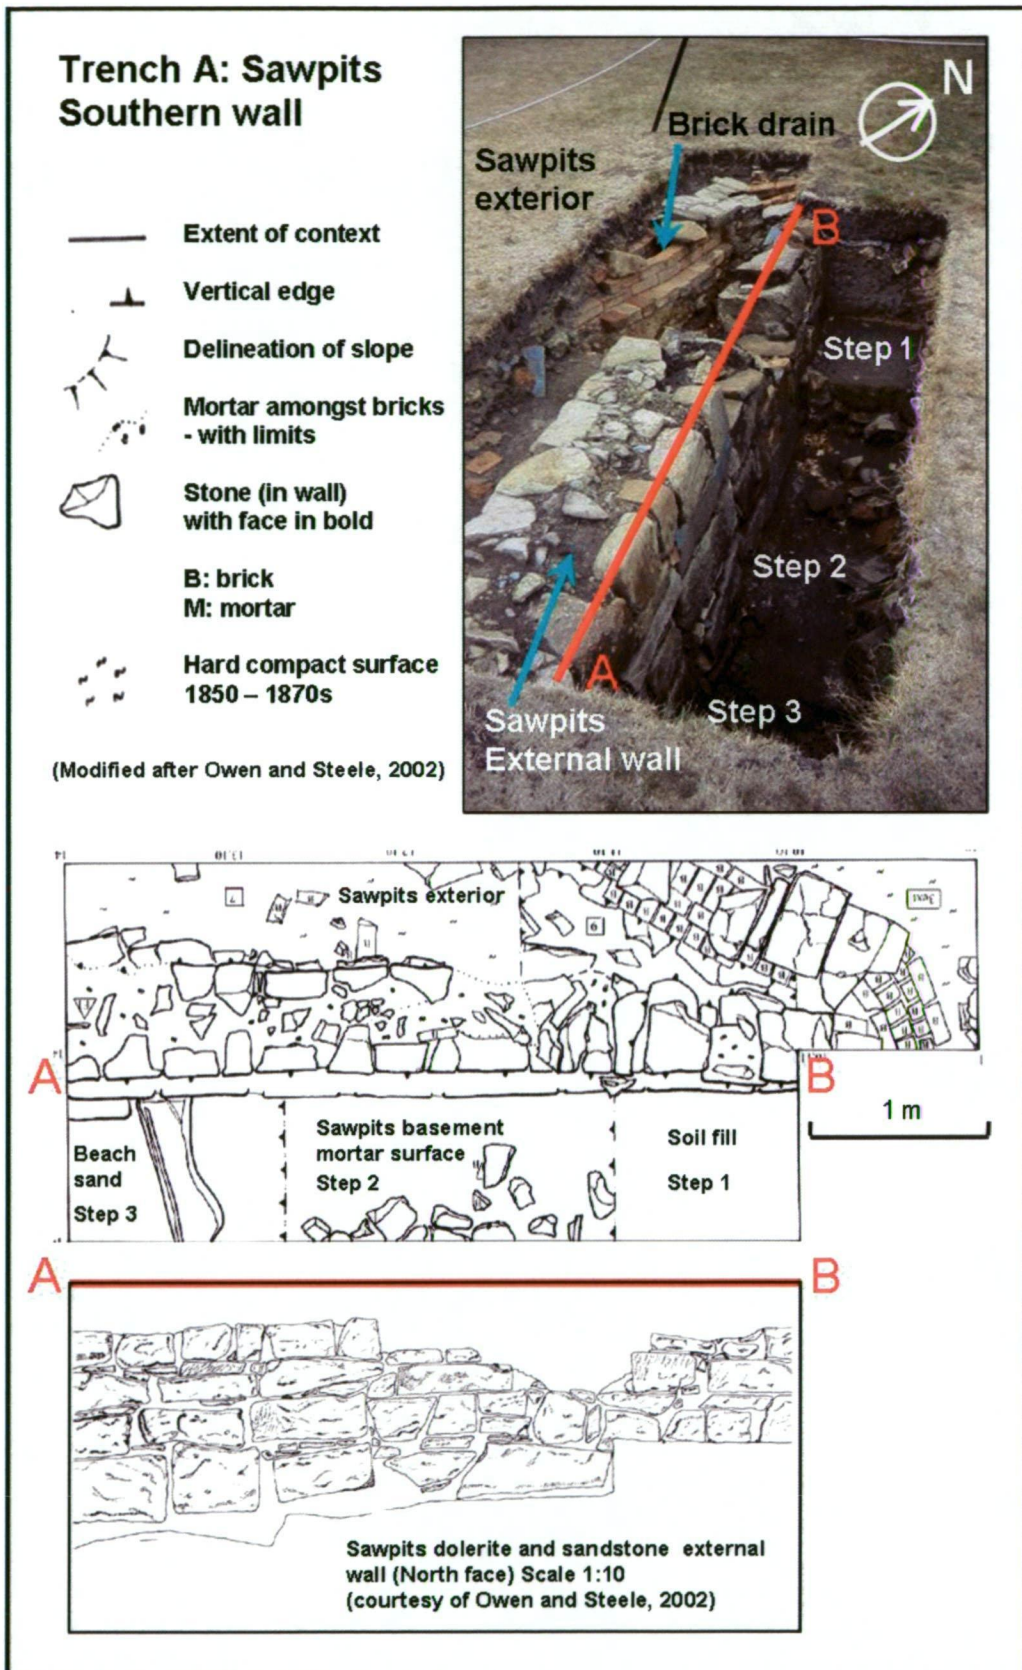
Photograph of Trench A (right) showing the Sawpit dolerite and sandstone external wall and contemporaneous brick drain with dolerite capping blocks. The Sawpit mortar floor deposit was uncovered at 1.43 m depth, as seen here with some of the rubble pit fill (photograph courtesy of the J. Johnston, 2002). Trench A final excavation plan (centre) and section drawing (bottom) along AB are both to scale (courtesy of Owen and Steele, 2002).
